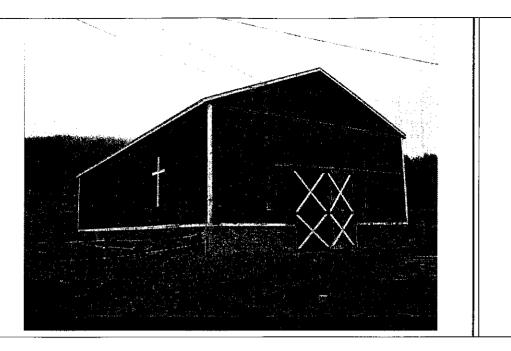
04/27/05 - Root Cellar (Building #4): Wood end wall needs repairs.
